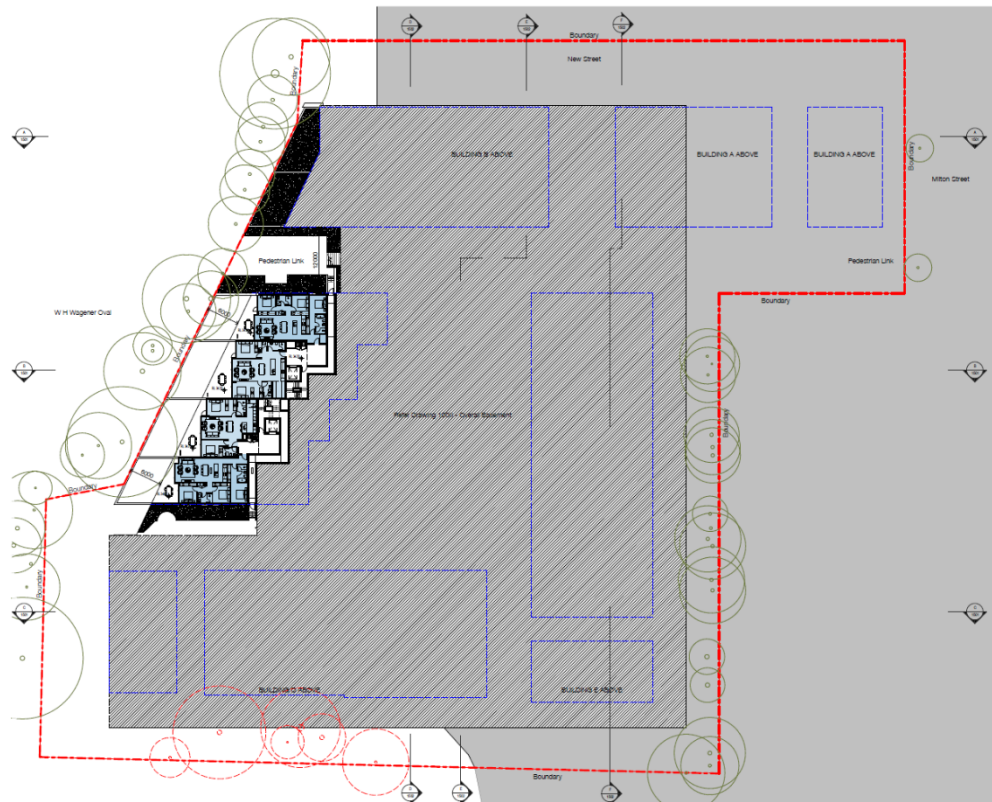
Proposed Overall Lower Ground Level Plan. (Source: SJB Architects)
